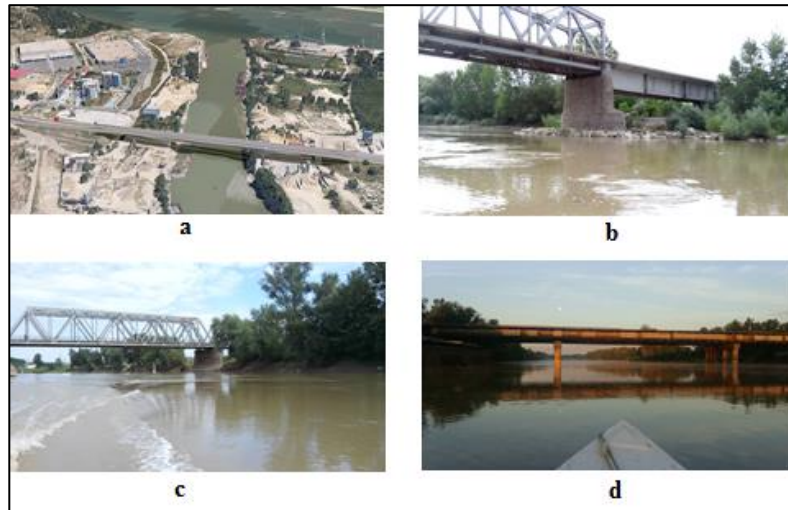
Elevated structures, *a – Galați-Brăila road bridge, b – Şendreni road bridge, c – Barboși railway bridge, d – ArcelorMittal conveyor belt
